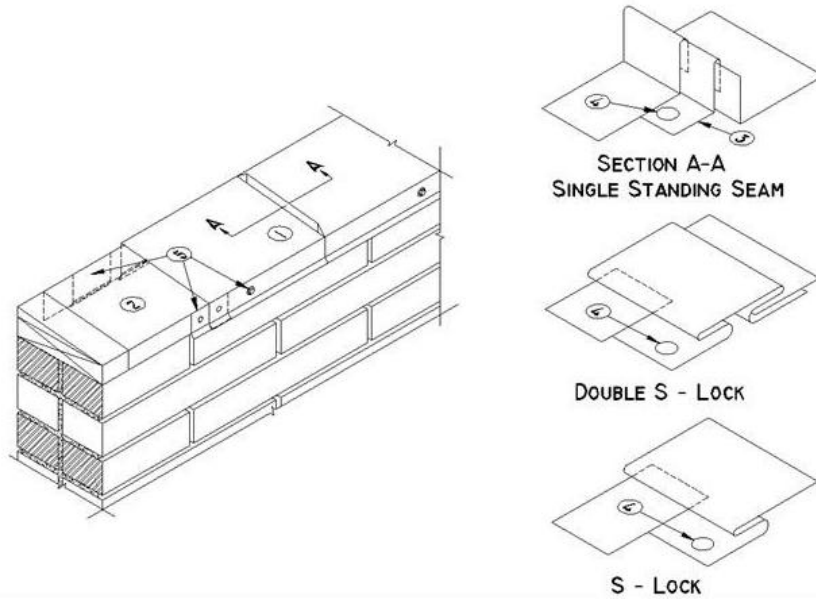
Flashing joint and joints (adapted from RGC 2012)
